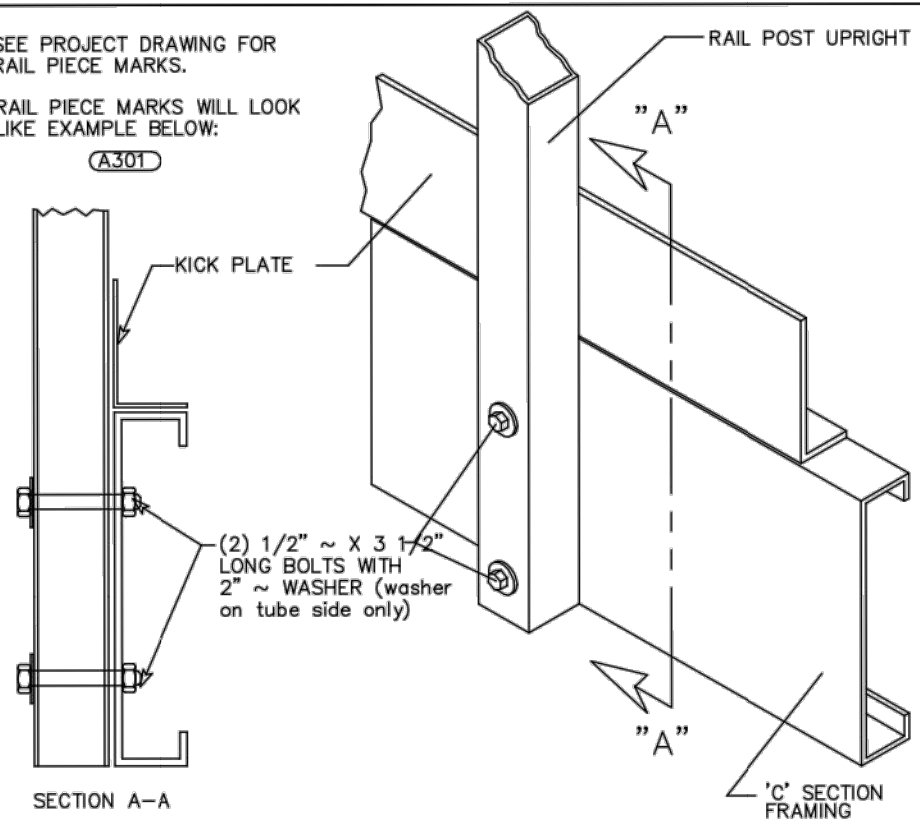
R TWO RAIL ASSEMBLY DETAIL
